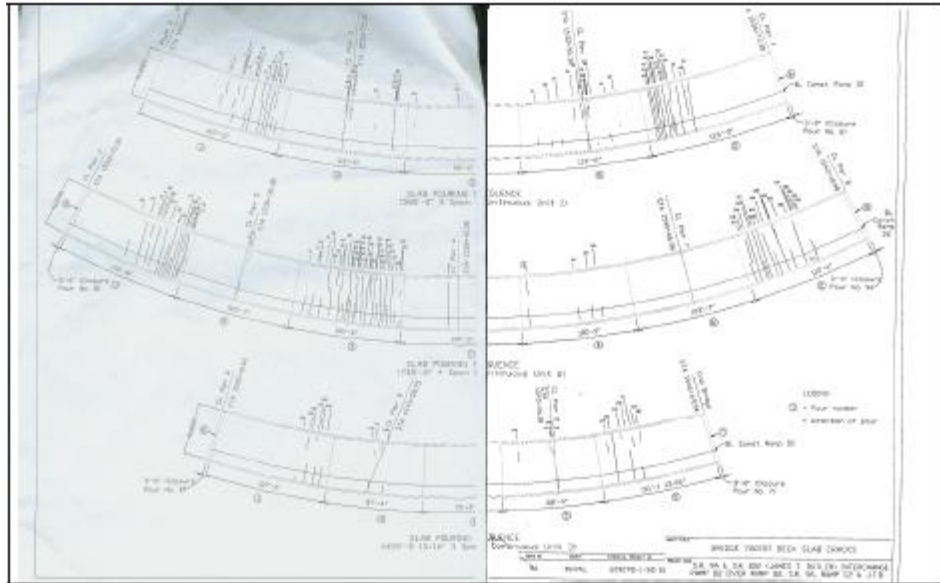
Full Sections of Bridge 706 and its Cracking Pattern
